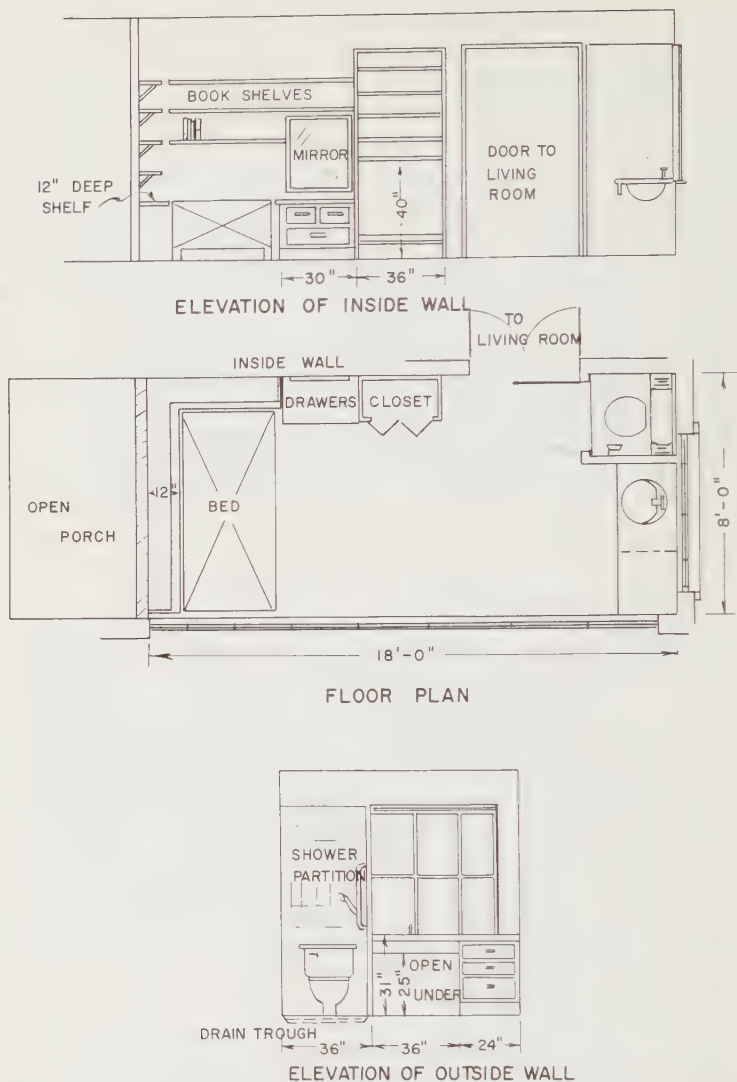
Proposed bedroom-bath plan for Mrs. D. (a), Move open porch wall as shown. (b), Install toilet and flexible shower arm in partition; make sink-vanity top 31 inches high; add shelves, drawers, and closet. (c), Provide electric panel heating and raise floor to level of living room floor.
